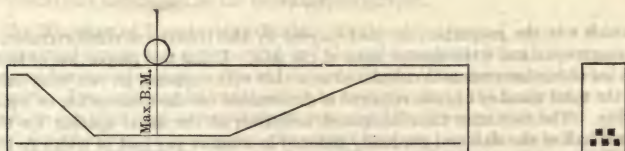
Reinforcement for Unsymmetrically Placed Concentrated Load
